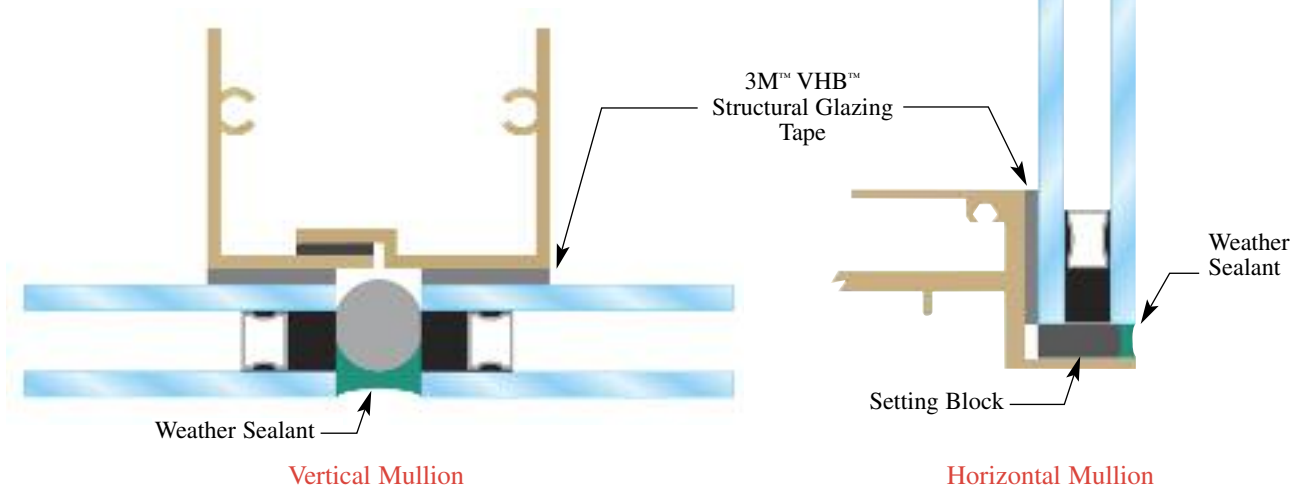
Glazing sections with 3M™ VHB™ Structural Glazing Tape as the primary bonding component
